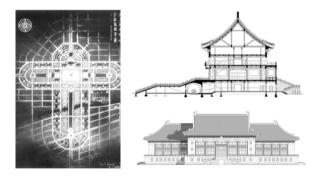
Dong Dayou, *Greater Shanghai Civic Centre*, Shanghai (1931) – Plan; and Dong Dayou, *Mayor's Building*, Shanghai (1933-5) – Section and Façade
